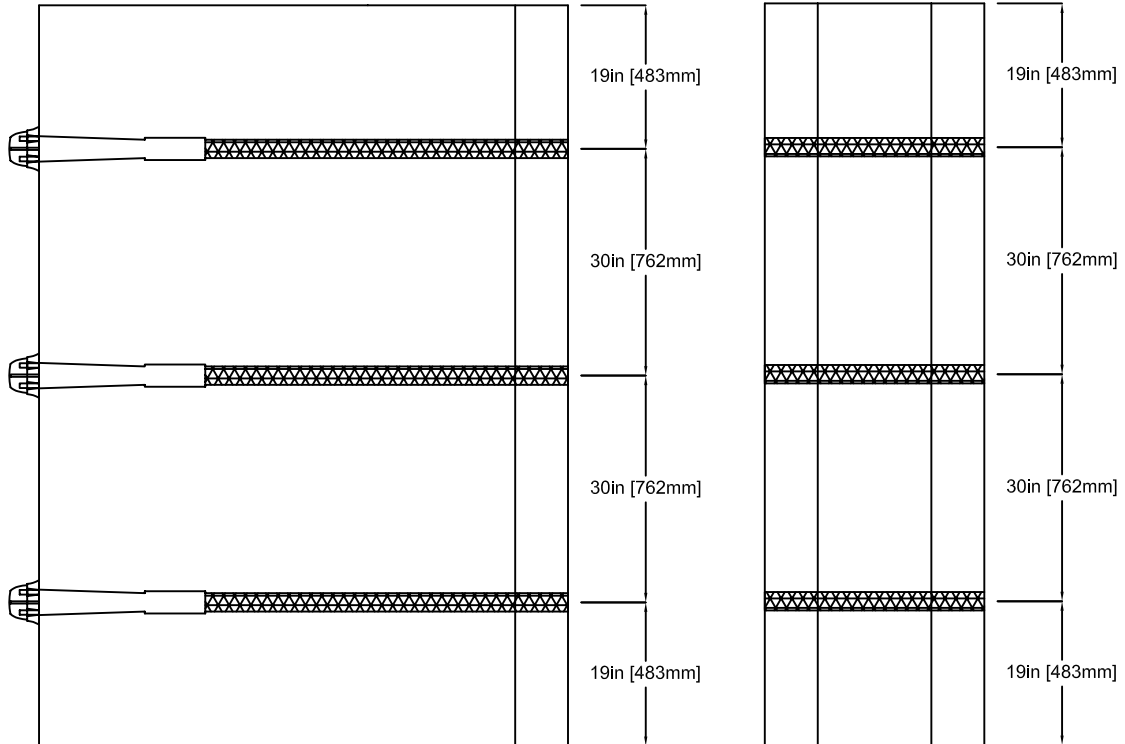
Bridge Plans Sheet 16; Duct Details.
